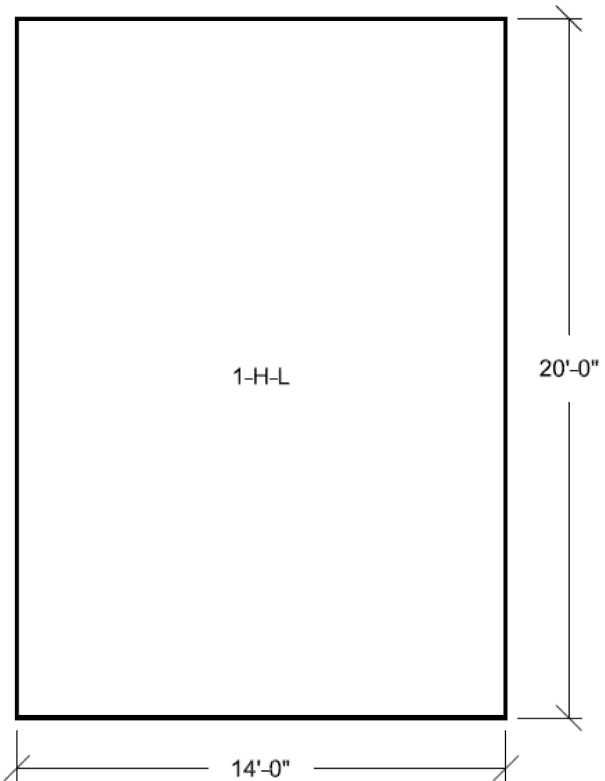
H.6-175 DGFOV Wall 9 Looking From Outside Horizontal Reinforcement Zones Far Side Face
